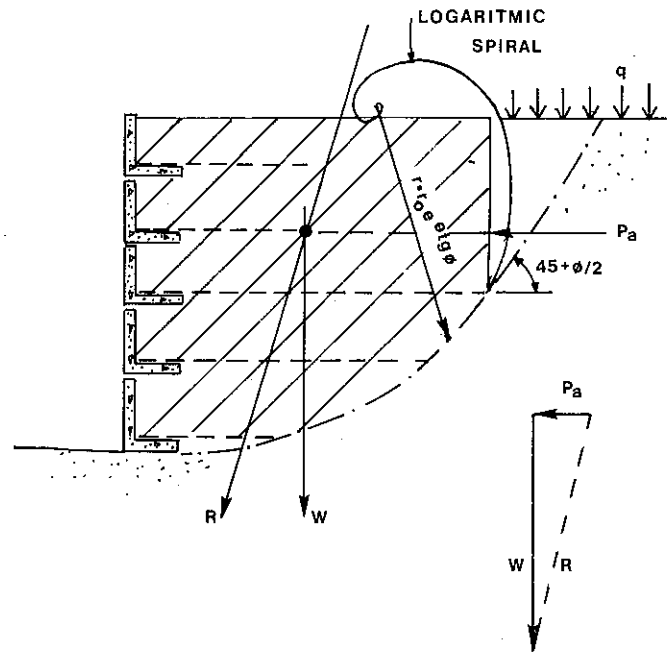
Stability of the wall with respect to a failure surface extending behind the fabric reinforcement.
